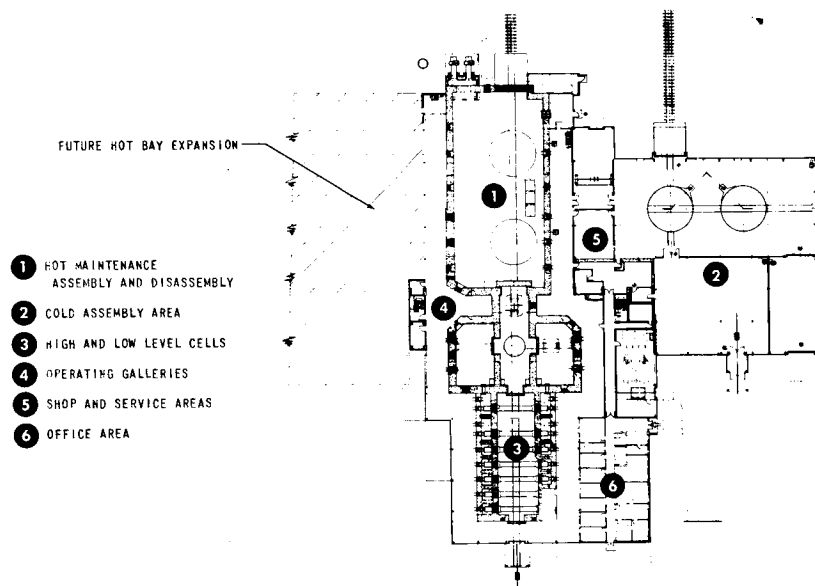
E-MAD FACILITY FUNCTIONAL AREAS (1ST FLOOR PLAN VIEW)
